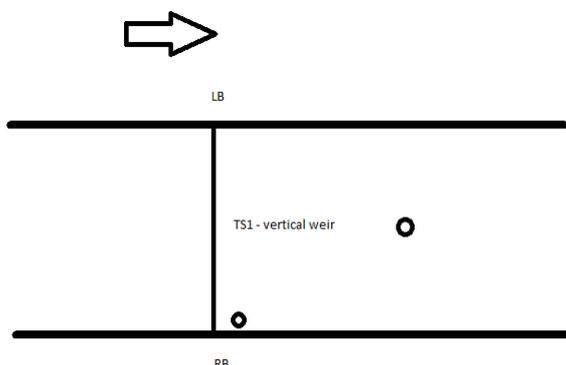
Site plan for Twickenham Barrier 1
